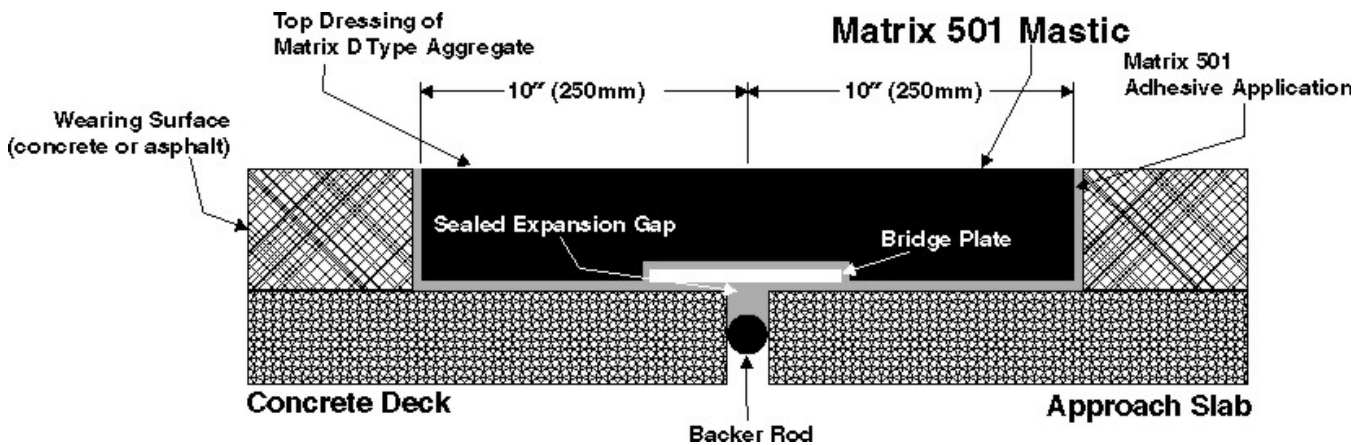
Typical Matrix 501 Asphaltic Plug Bridge Joint System Installation
